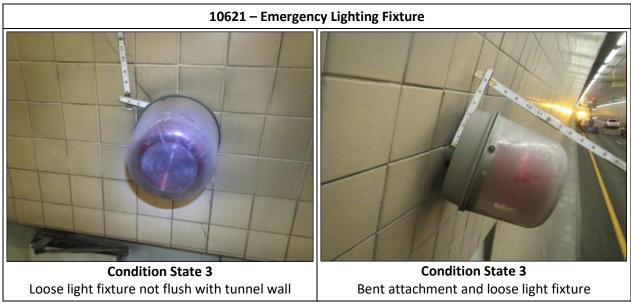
10621 – Emergency Lighting Fixture Condition Rating Example Photos
